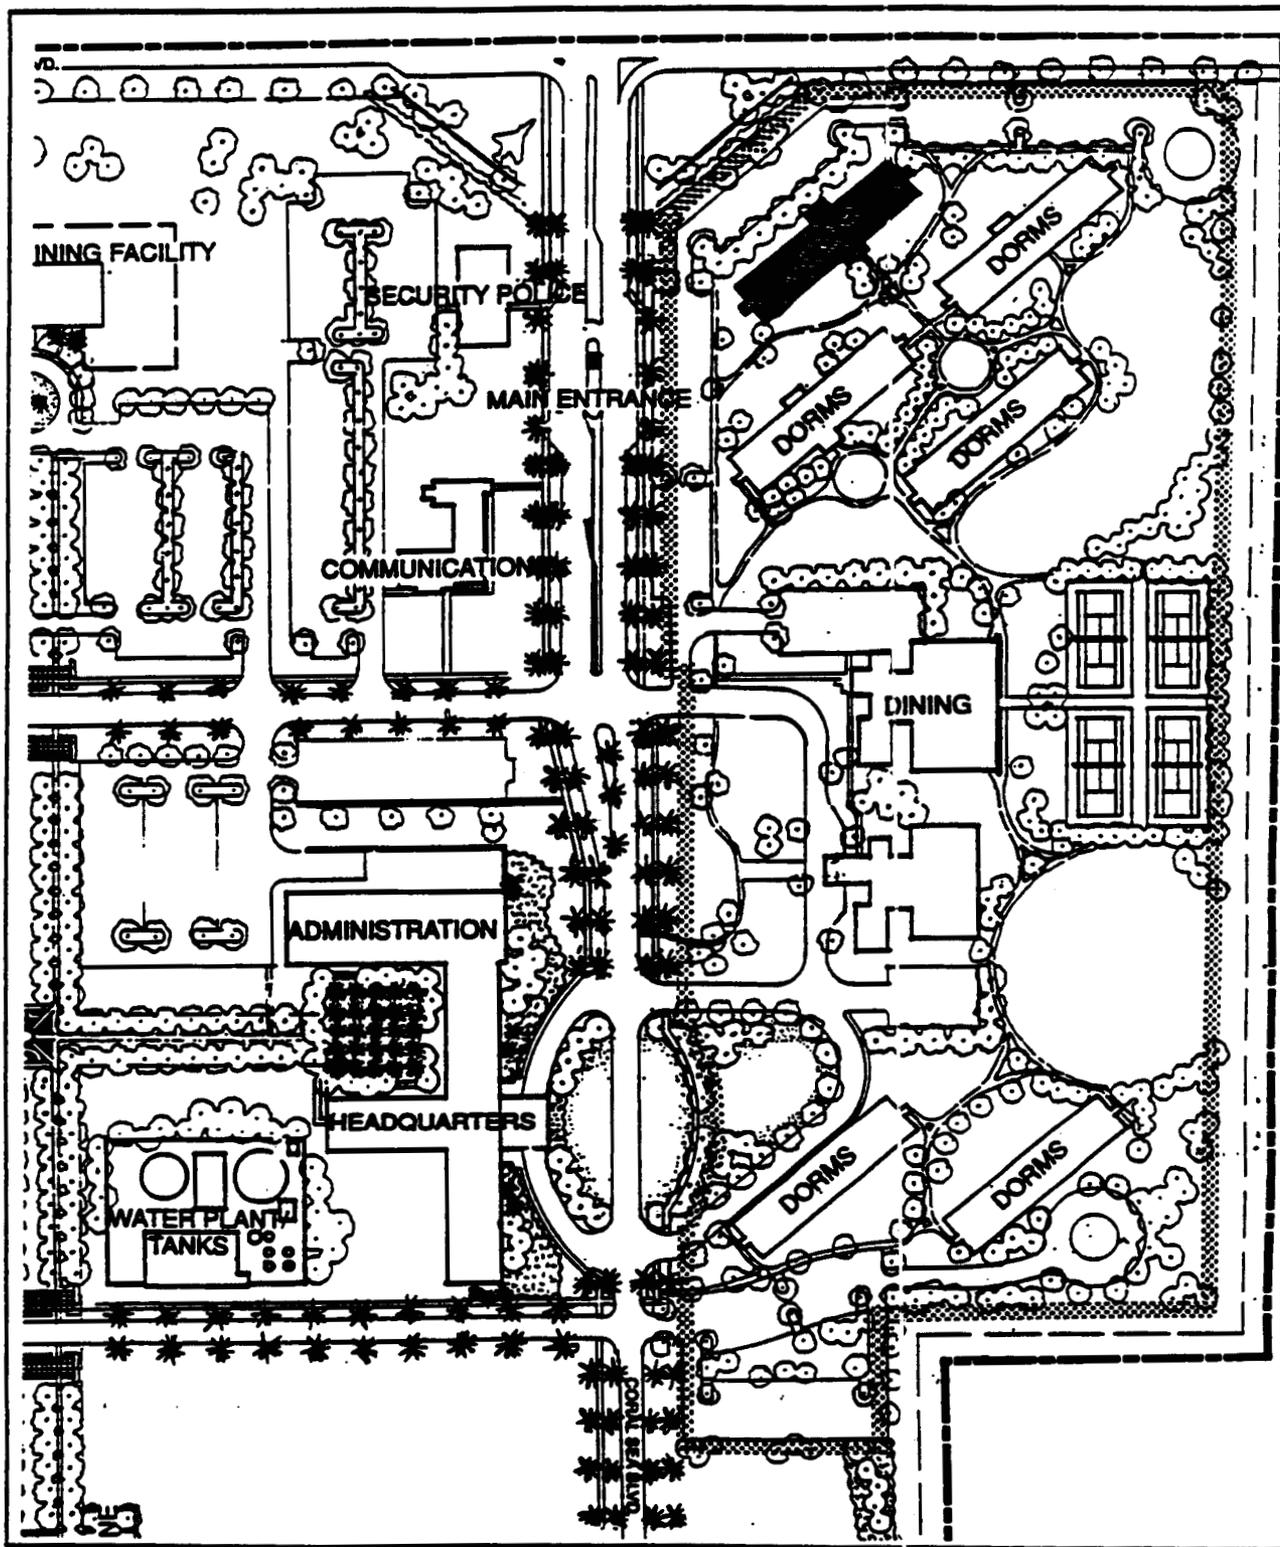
Area Development Plan for Dormitory (Building 476)
